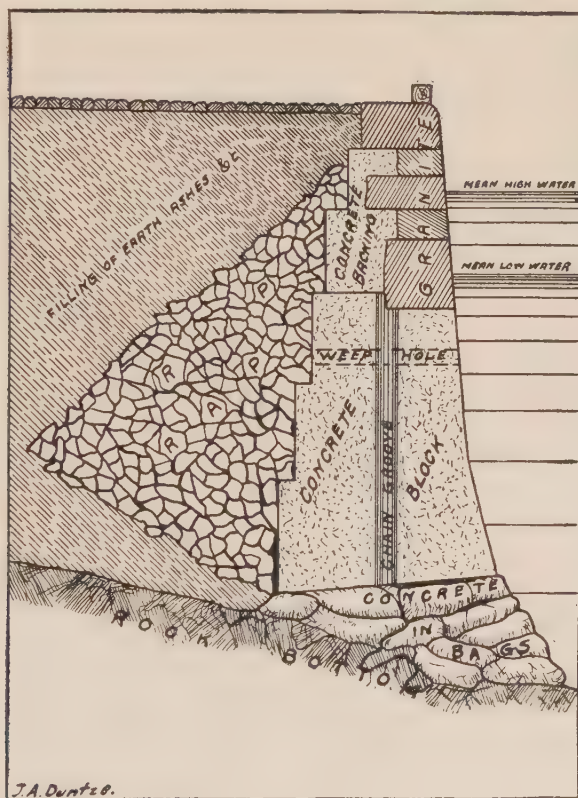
BULKHEAD WALL ON ROCK FOUNDATION, NEW YORK, N. Y.
